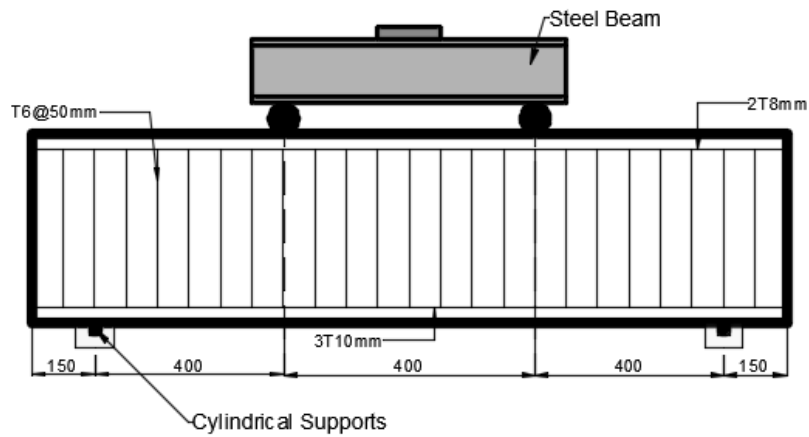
Longitudinal section of beam with supports and loads (dimensions in mm)
